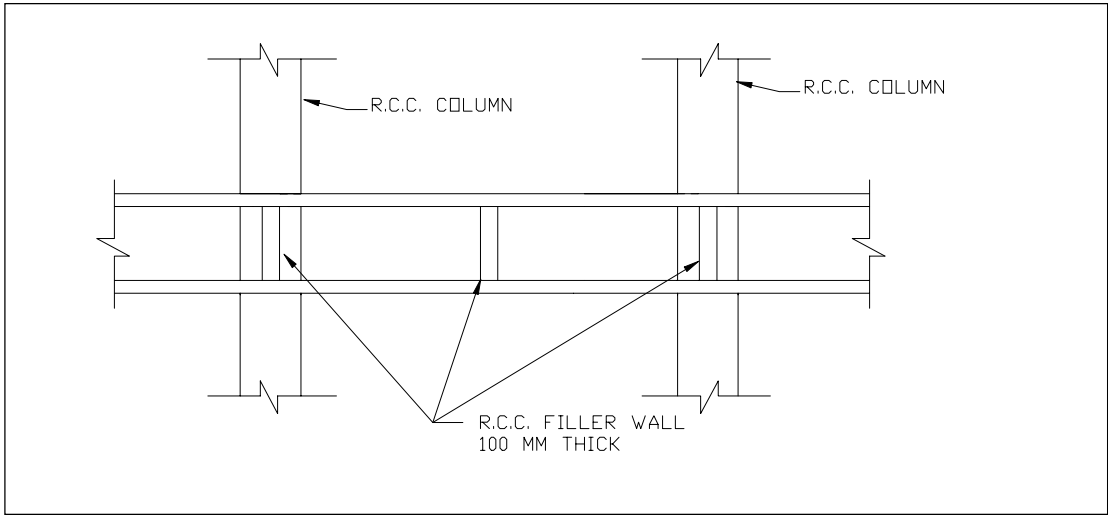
(e): Sectional Elevation through cantilevered box showing diaphragms/filler walls
